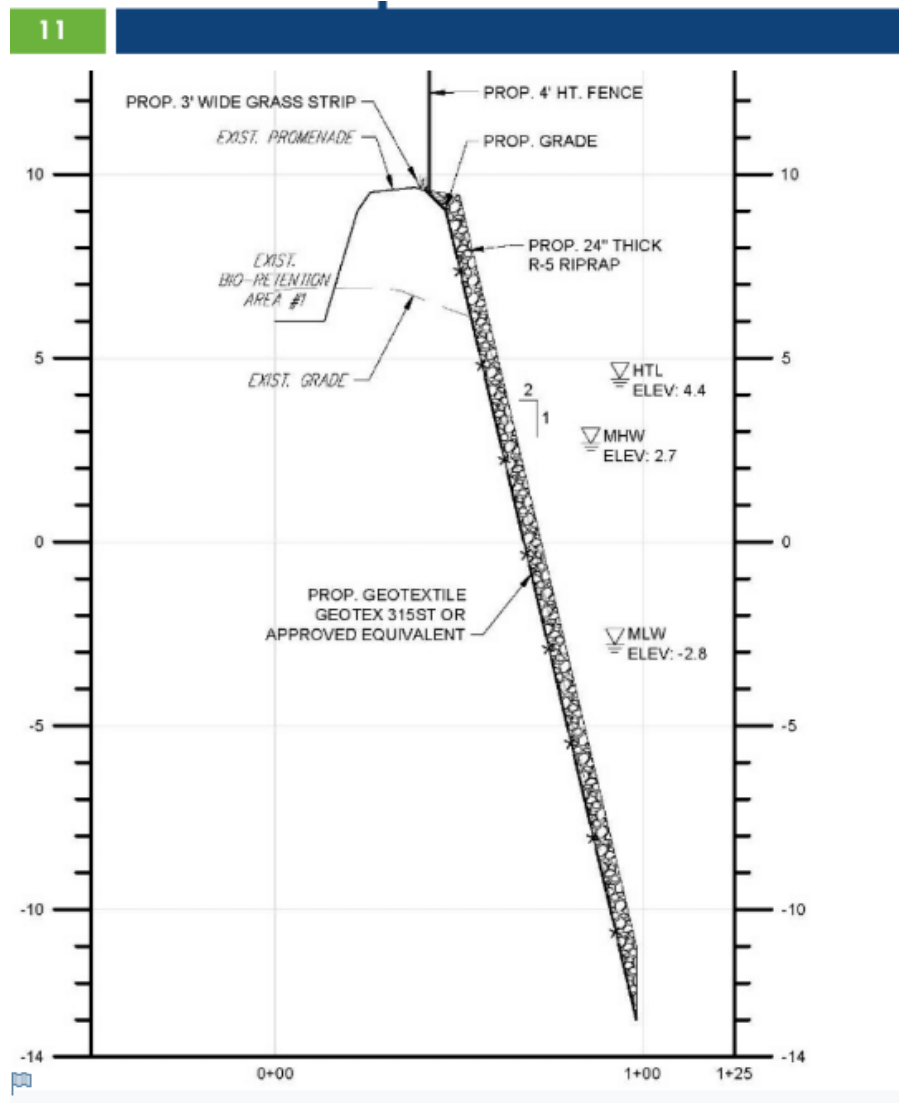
Slide #12 from the Permit Application, Similar Revetment West Bank
